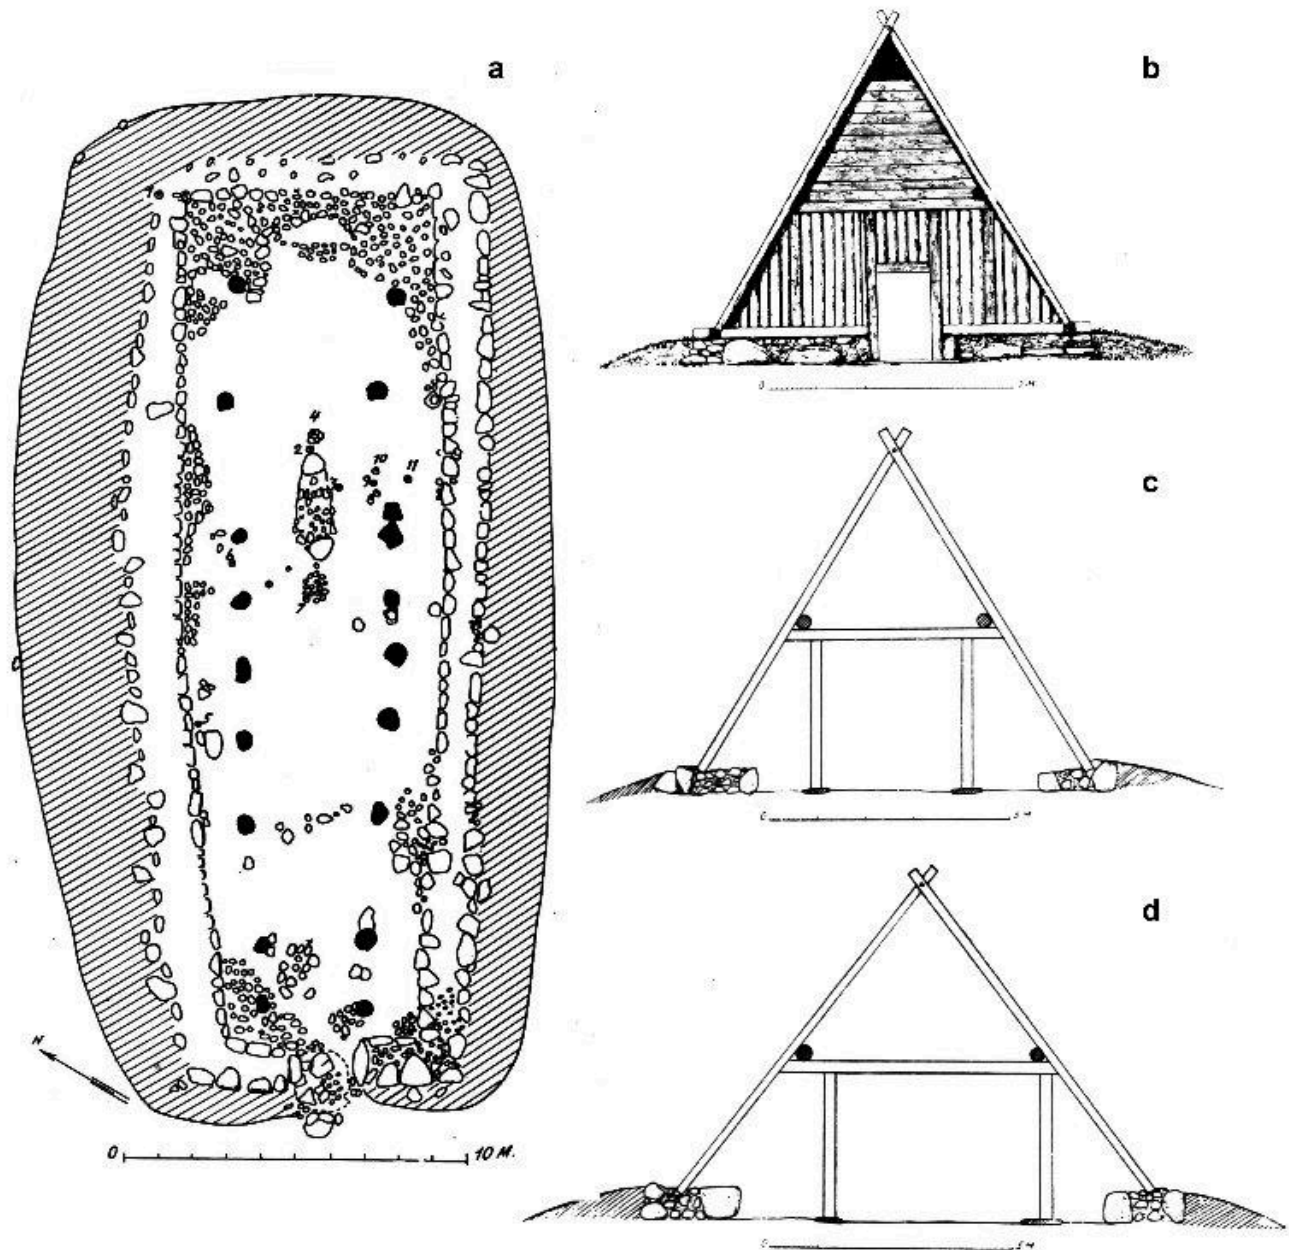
EXCAVATION PLAN OF A MIGRATION PERIOD HOUSE AT LOJSTA (GOTLAND) AND ELEVATION OF THE RECONSTRUCTED ENTRANCE WALL AND CROSS-SECTIONS AT THE SECND AND FIFTH TRESTLE FROM THE ENTRANCE (AFTER BOETHIUS & NIHLÉN 1932)
